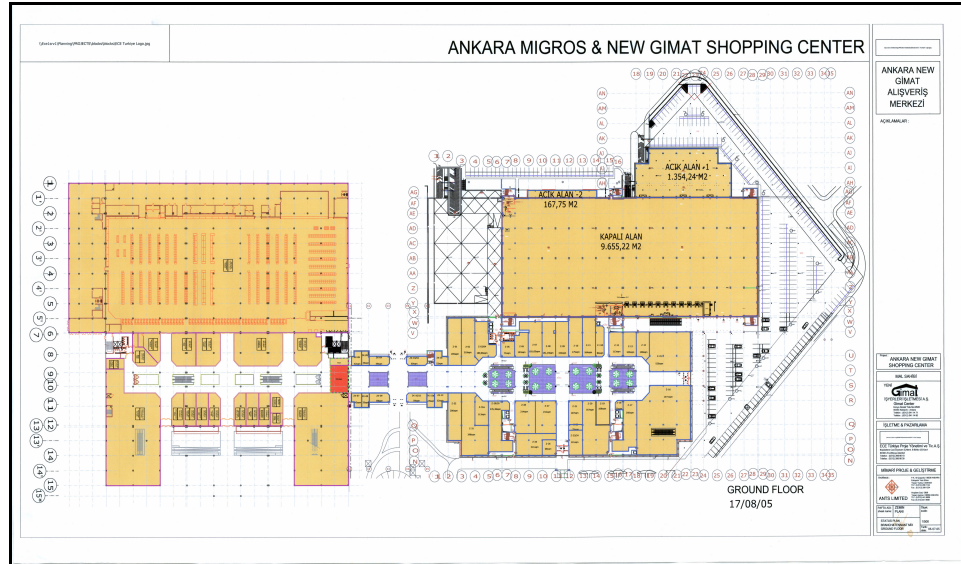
The Ground Floor Plan (Yeni GİMAT A.Ş., 2006)
